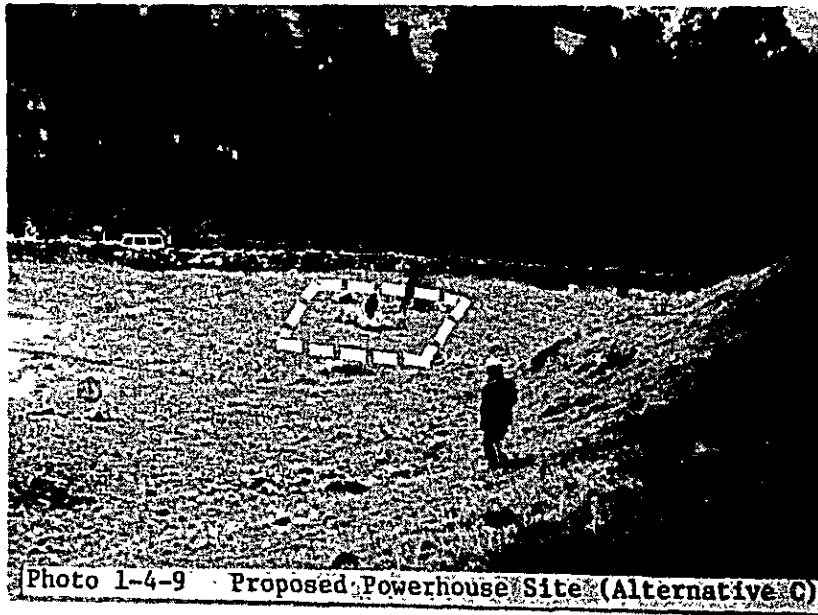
Proposed Powerhouse Site (Alternative C)
